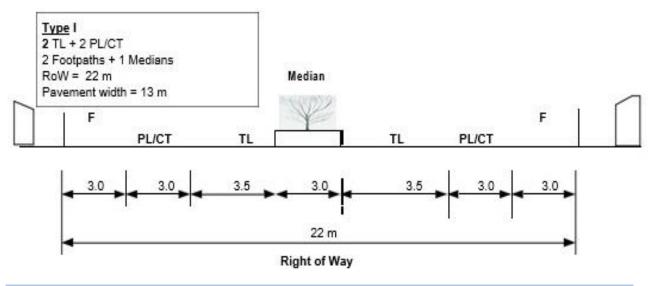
Typical Cross-section for DCRN Roads (with RoW 22m)
